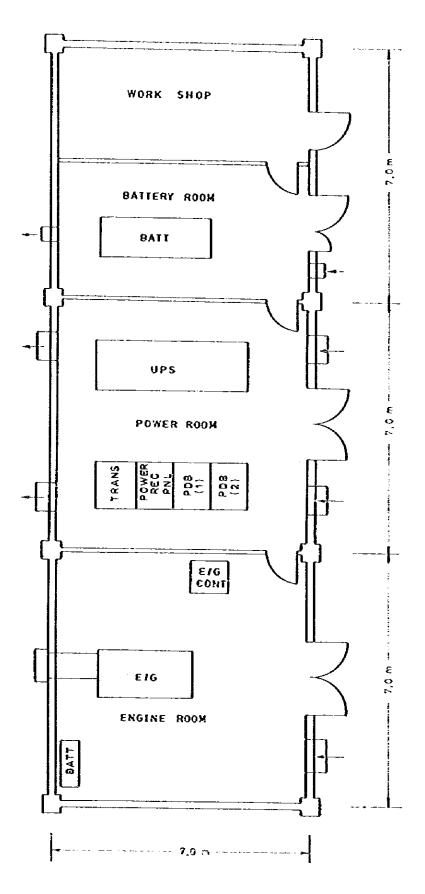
Typical Equipment Floor Layout for Master Earth Station (1/2)
